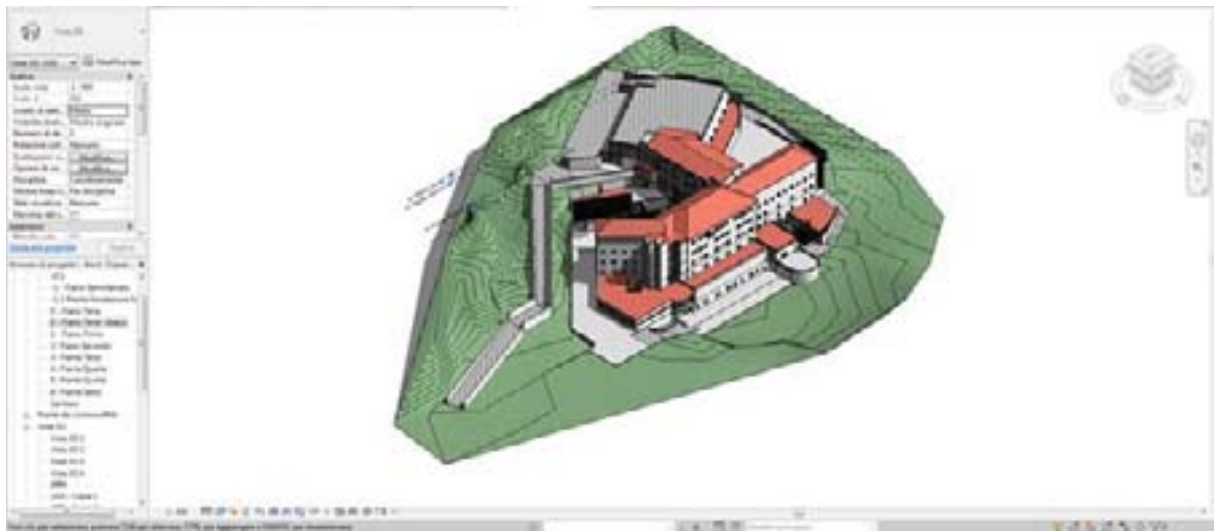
3d view of the architectural model. Made with Autodesk Revit.
